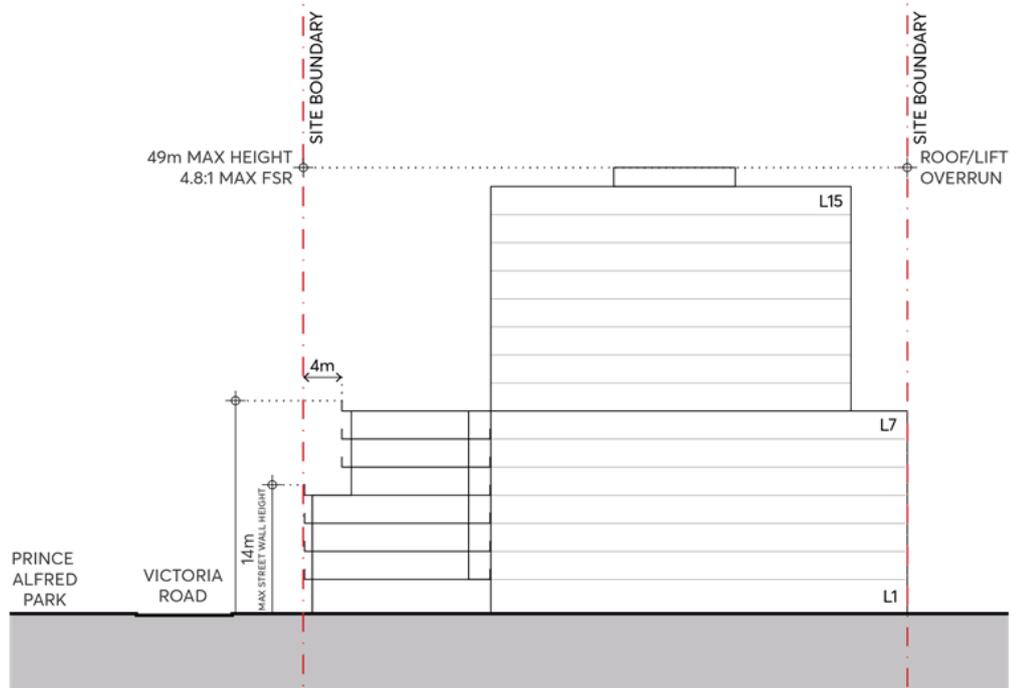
North - South Section of Site Building Envelope
